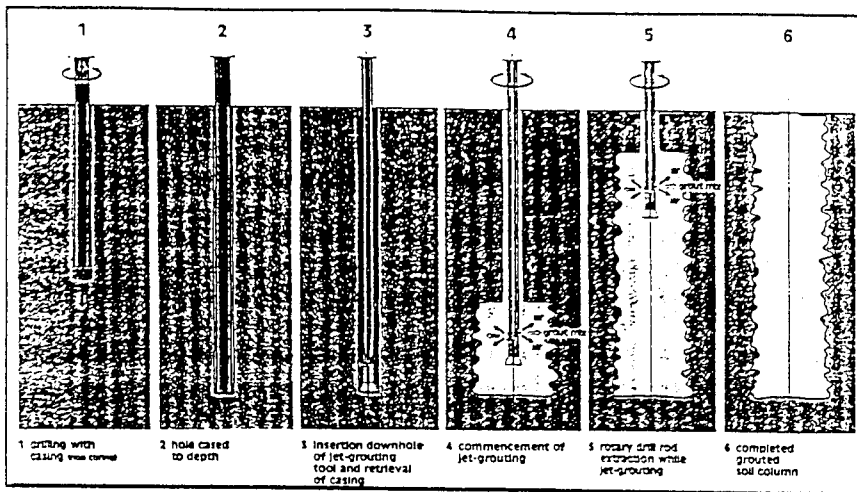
Construction sequence of two-fluid (R2) jet grouting.
